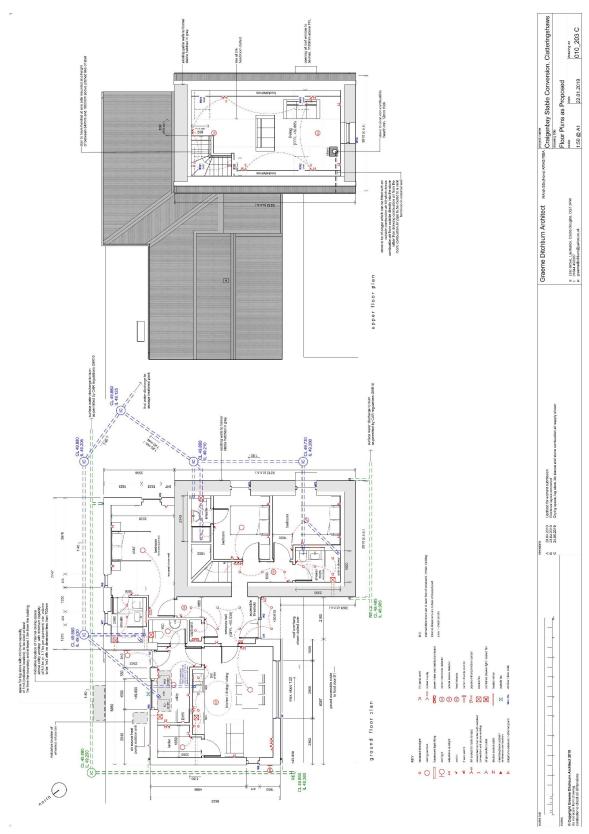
detailed site plan (kindly provided by Gary Mckeand) (c) Graeme Ditchburn Architect
